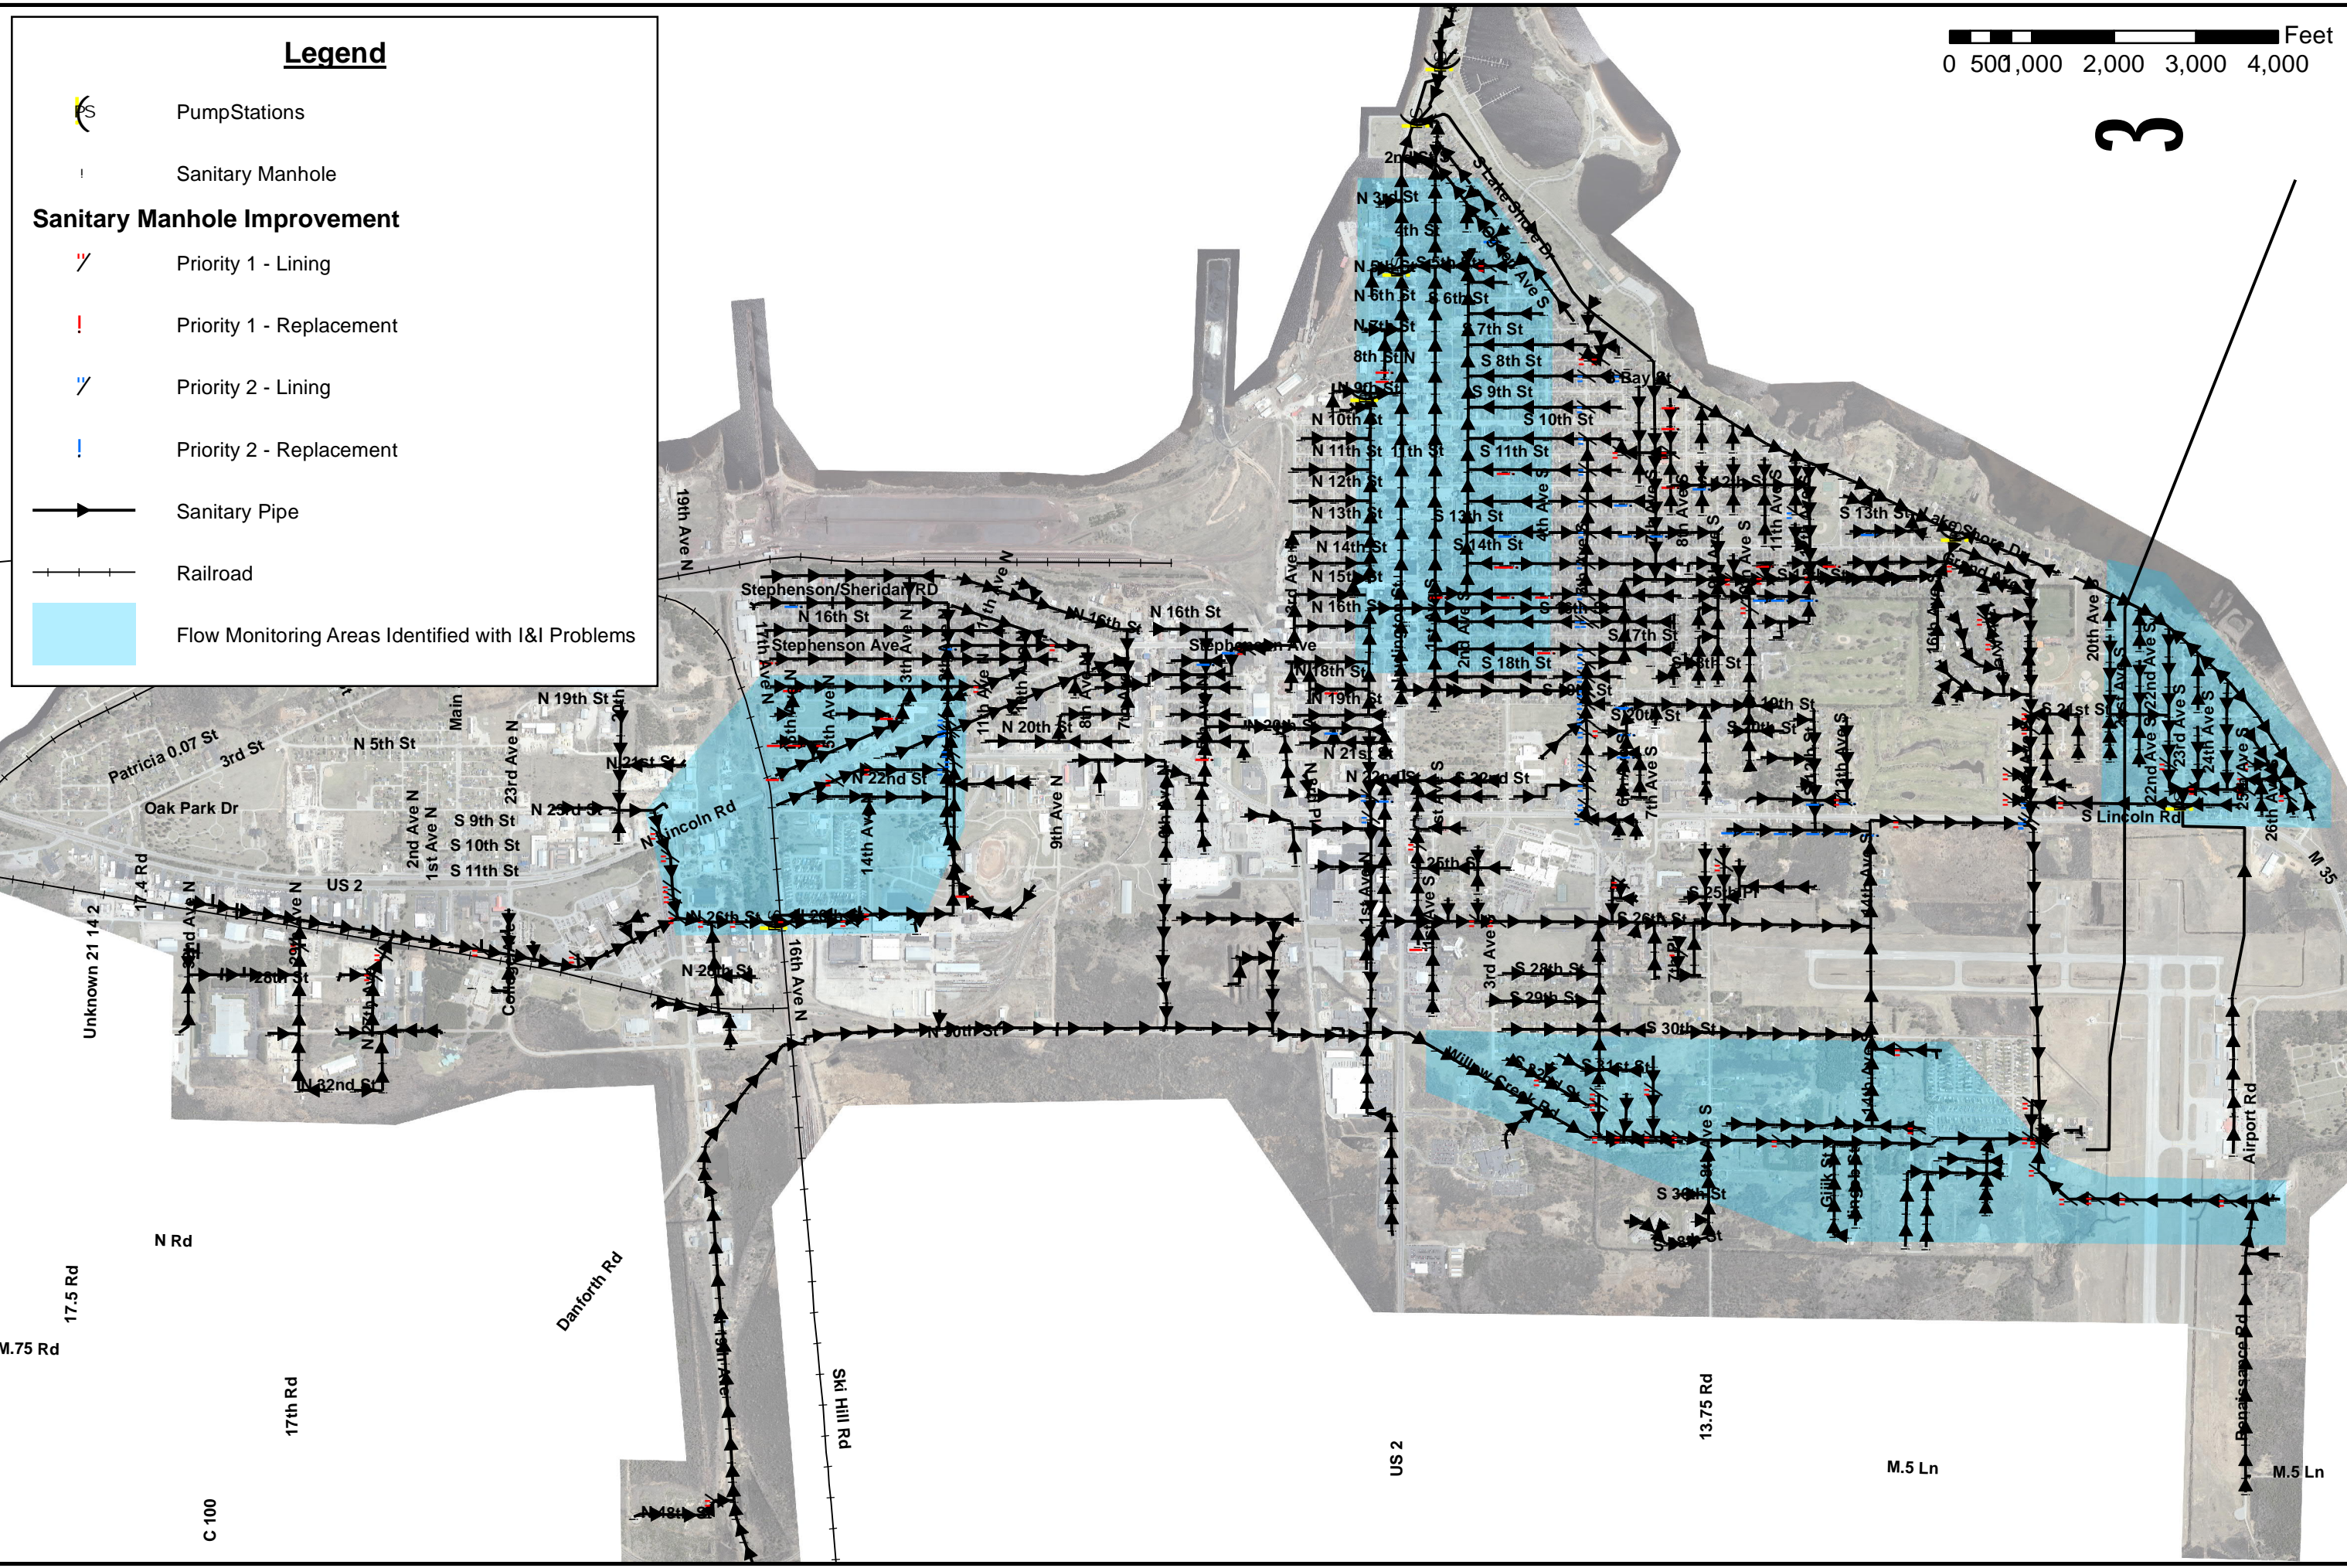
PROPOSED MANHOLE IMPROVEMENT LOCATIONS
